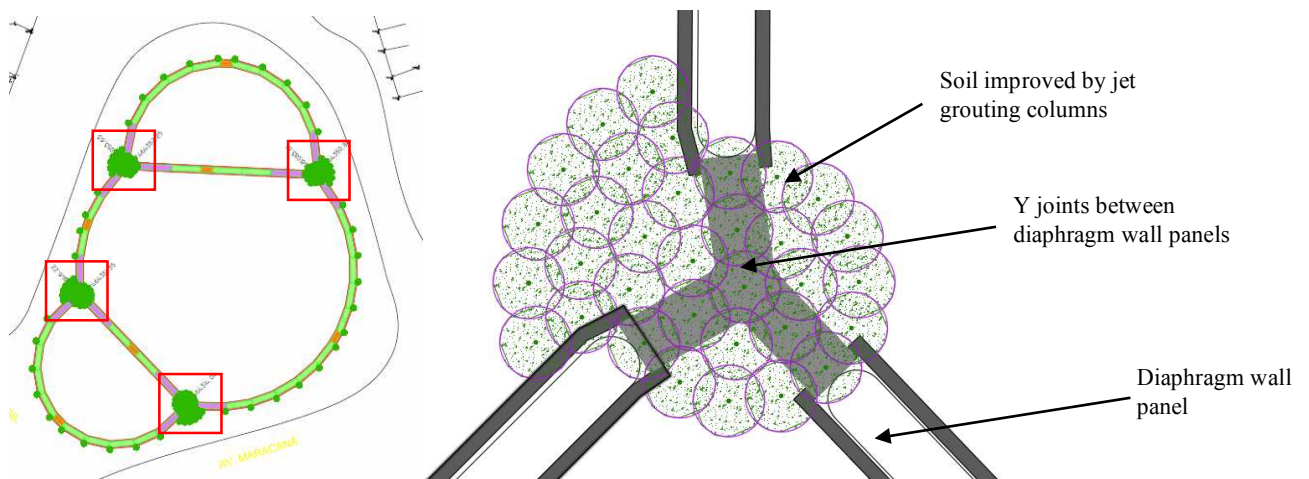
Plan view of the excavation showing the Y nodes between intersecting diaphragm wall panels. Left: location of Y node; right: details of the ground improvement with JG columns
